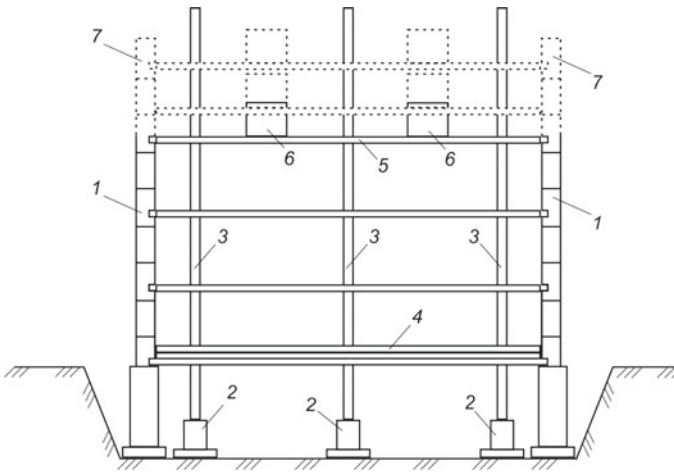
Installation of the embedded frame by the floor-lifting method (stage of the overlapping slab concreting): 1—existing walls; 2—foundations for the embedded frame; 3—columns; 4—floor slab package
